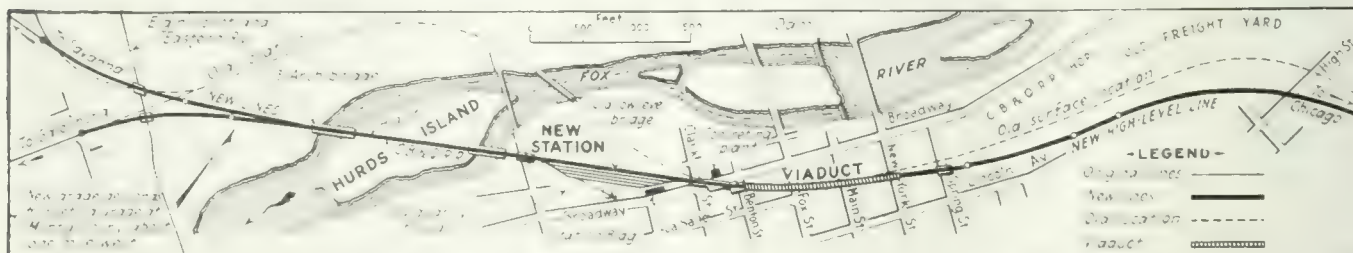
RELOCATION AND TRACK ELEVATION AT AURORA, ILL. C. B. & Q. R.R.
